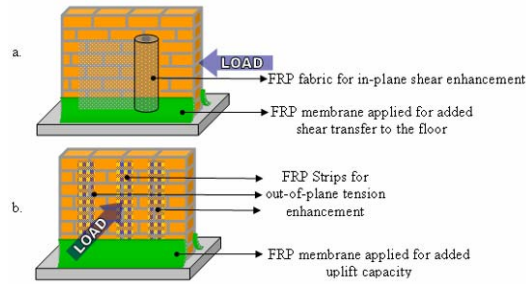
Strengthening system using FRP for URM brick walls: a. In-plane shear strengthening; b. Out-of-plane tension strips (face loaded, single side application)
